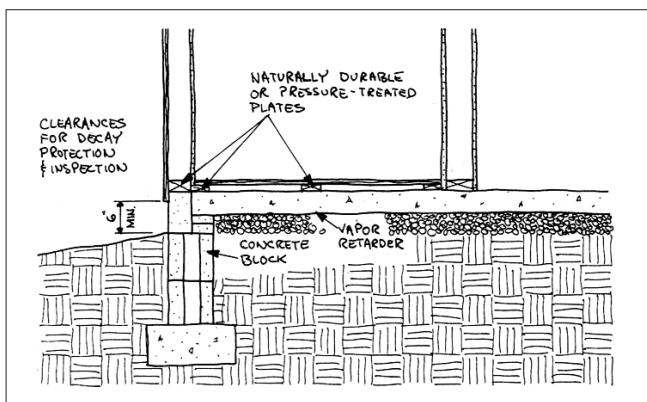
With concrete slabs, clearance between wood siding and earth should be at least 6 inches, except if the siding is pressure-treated or naturally durable wood.
